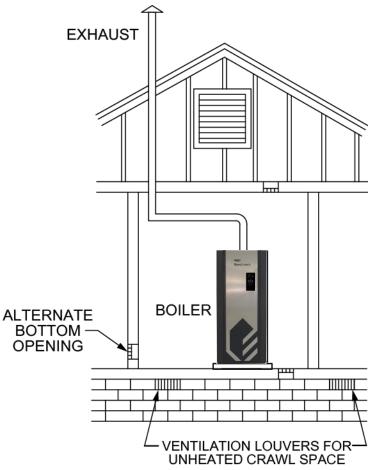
All Combustion Air from Outdoors - Inlet Air from Ventilated Crawl Space and Outlet Air to Ventilated Attic
